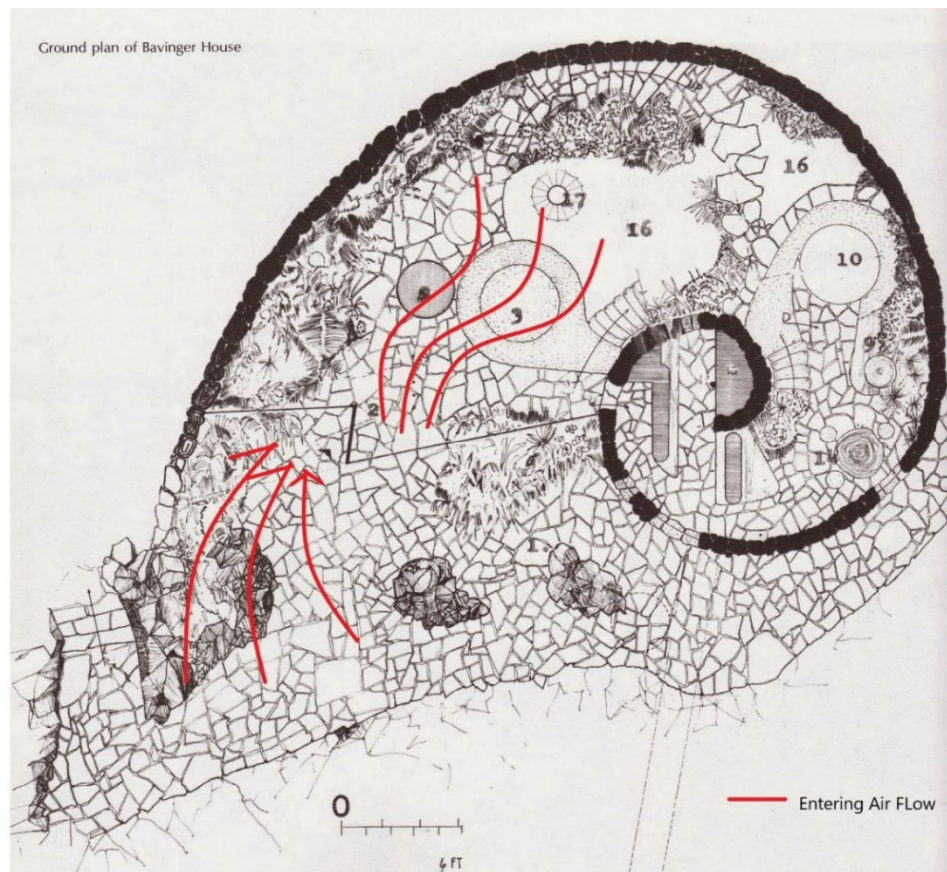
Ground Plan of the Bavinger house demonstrating air flow through the ground level. Image courtesy of Hidden Architecture.
